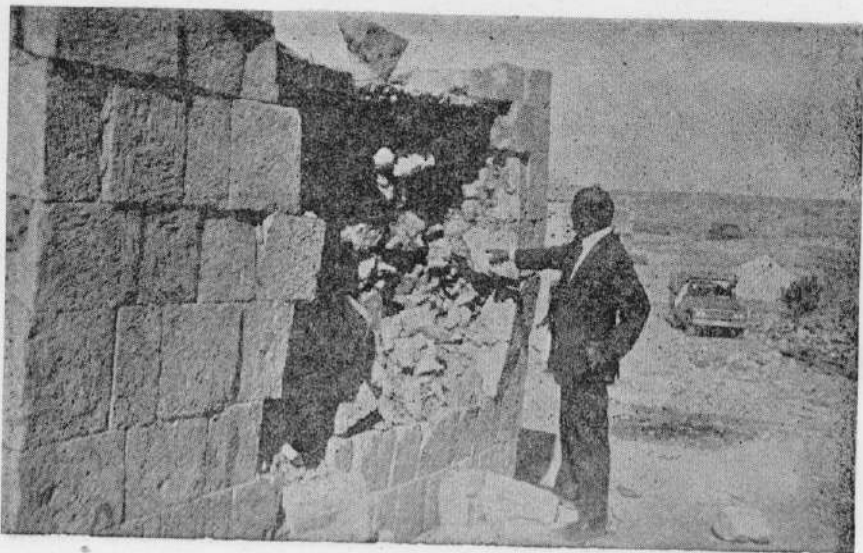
Outside dressed stone wall and inside small random stone and muck filling at Village Qubatil. Collapse of outer leaf of dressed stone.
